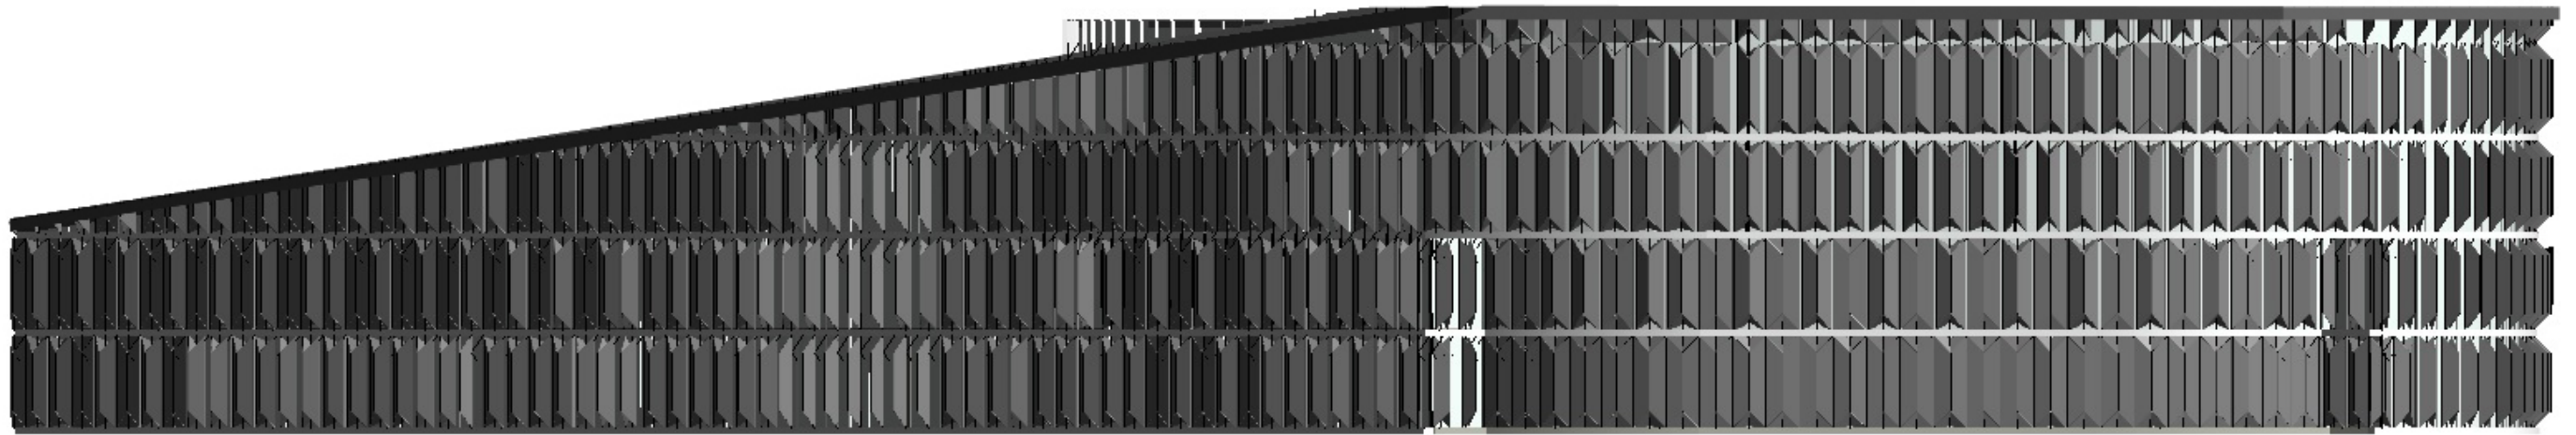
Elevation B with optimal kinetic facade pattern at 9 am.
